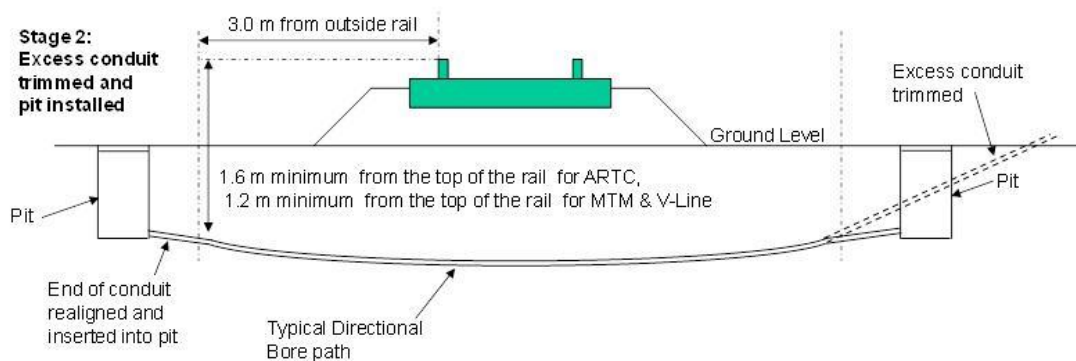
Construction of under Track bore Stage2 - Excess conduit trimmed and pit installed
